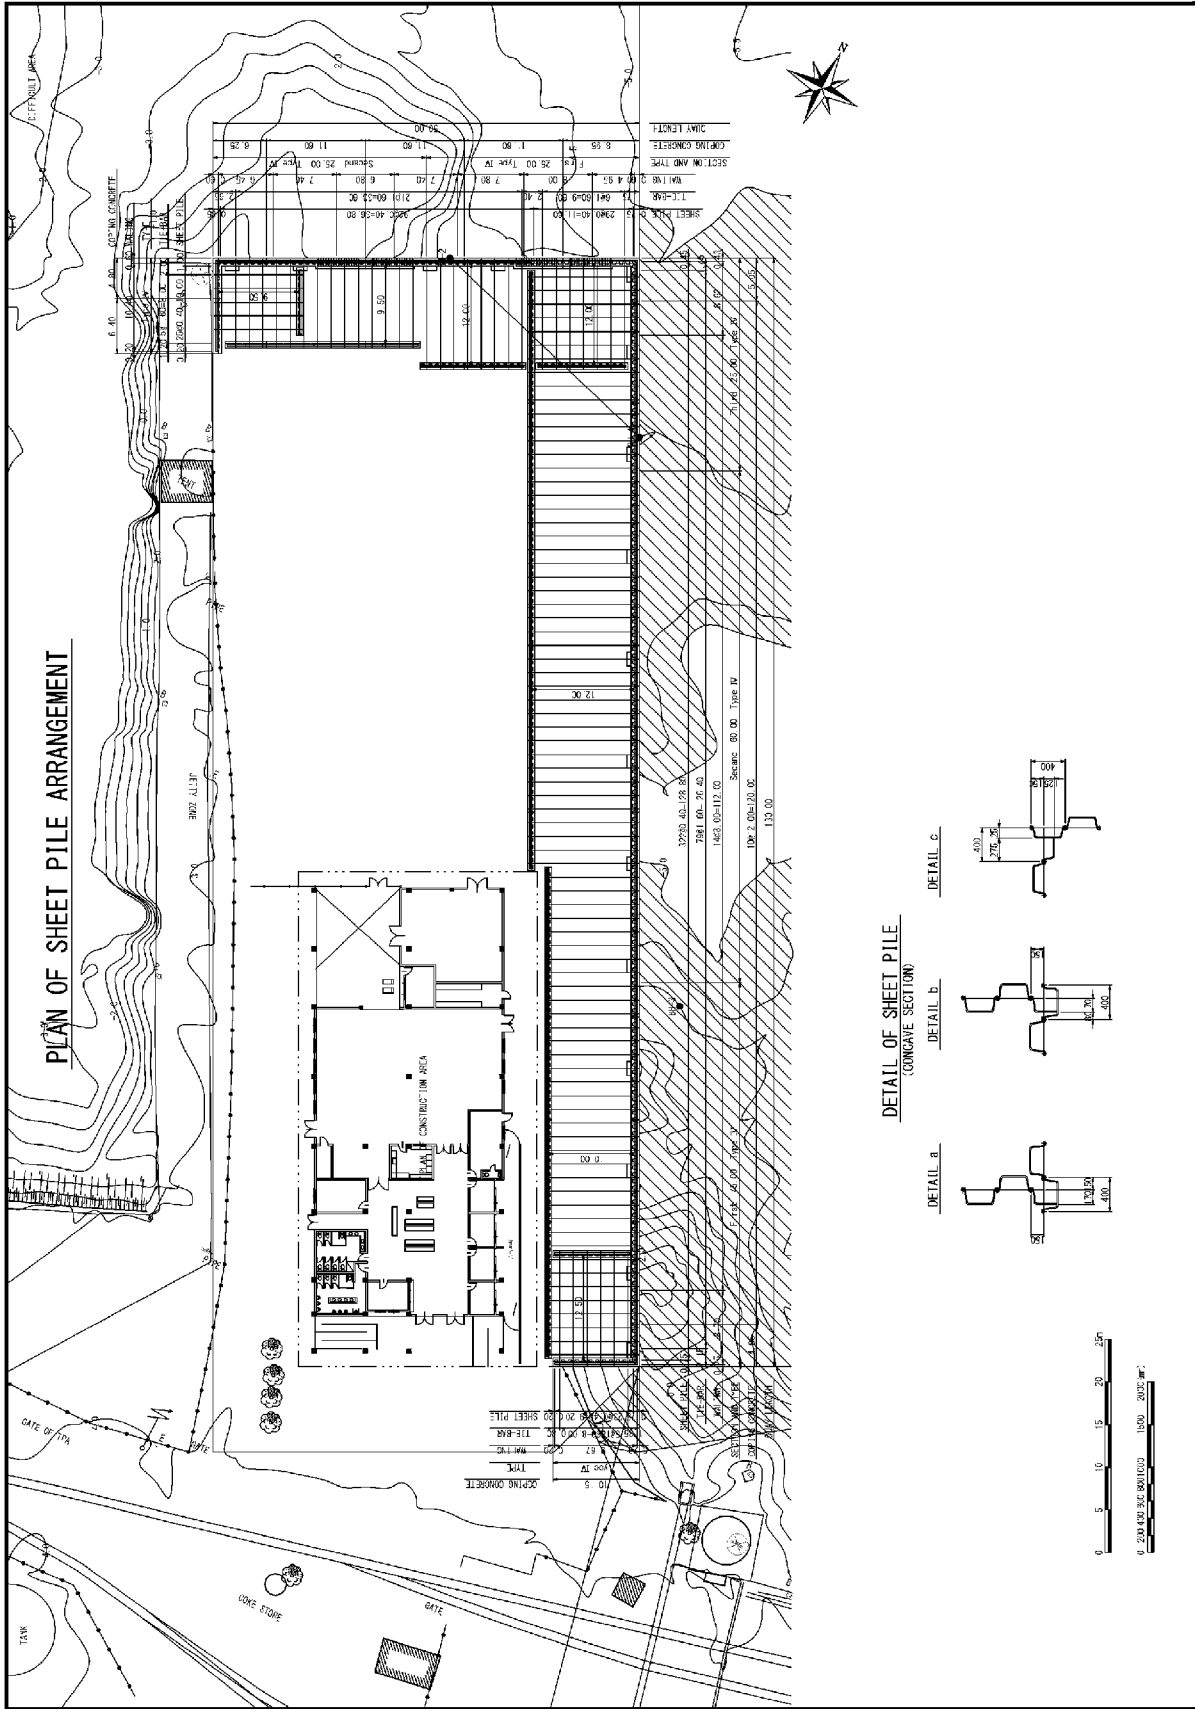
Plan of Sheet Pile Arrangement
